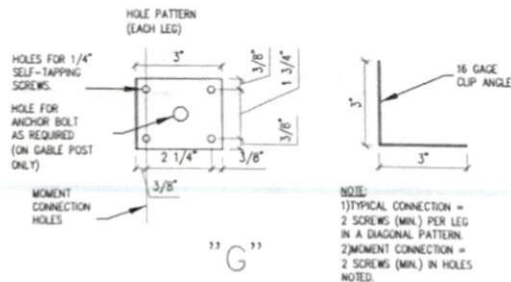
DETAIL FOR ATTACHMENT TO EXISTING STEEL FRAME.
